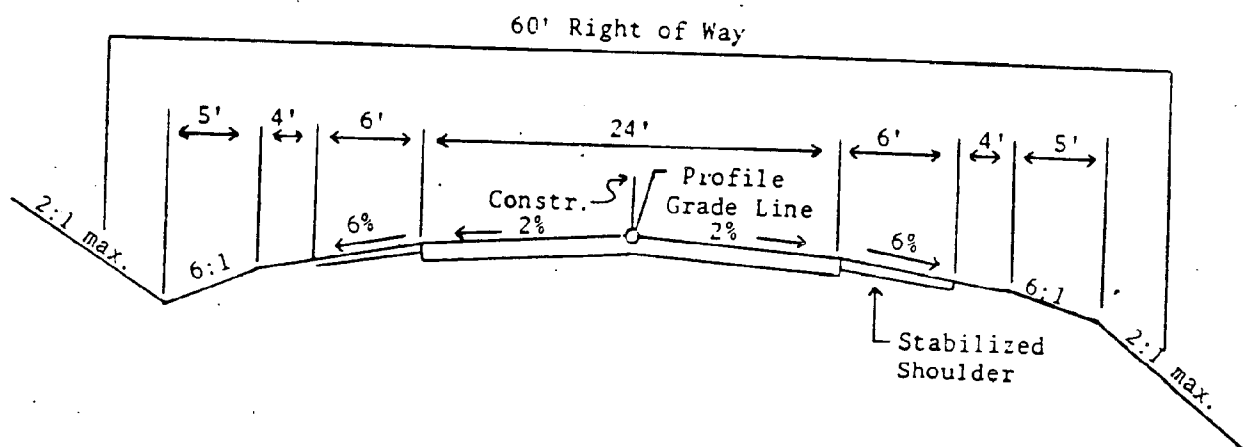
Typical Road Cross Section Using Vegetated Swales
